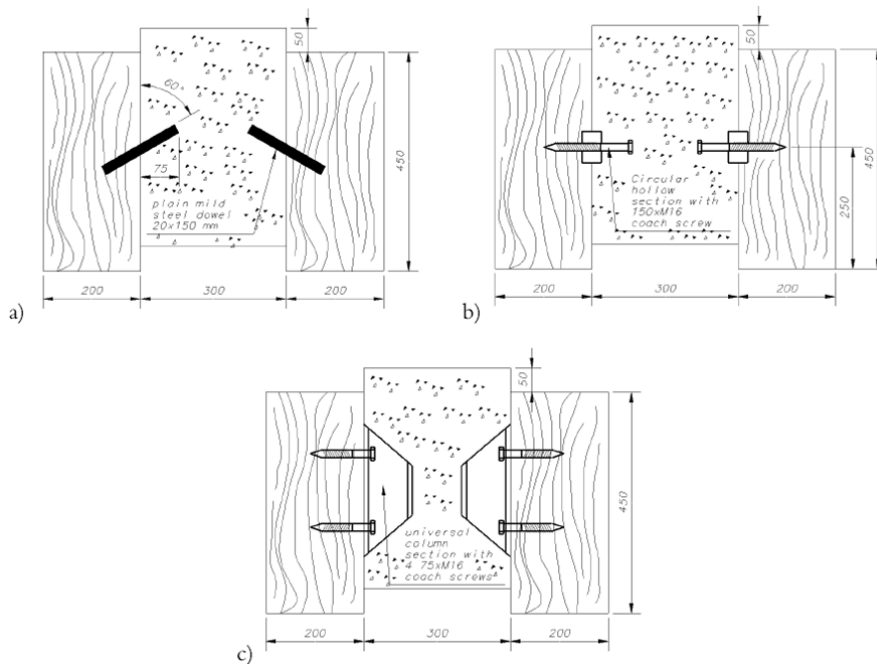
shear connectors for use in composite systems to construct new, or rehabilitate old, timber bridges: (a) 20 mm plain mild steel dowel inclined at 60°; (b) circular hollow section ; (c) universal column section (after Benitez 2000) (dimensions in mm)
